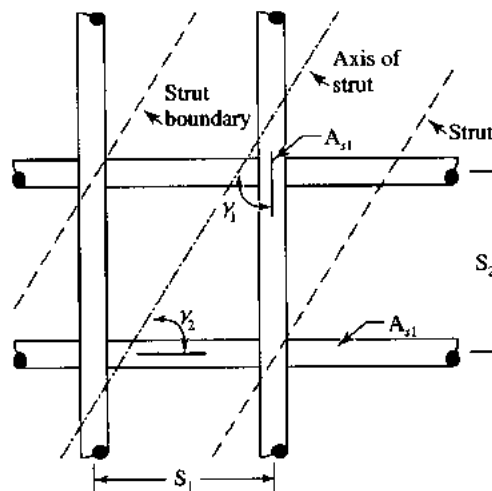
Reinforcing bars crossing a strut [1]. Courtesy of ACI 318-08.
